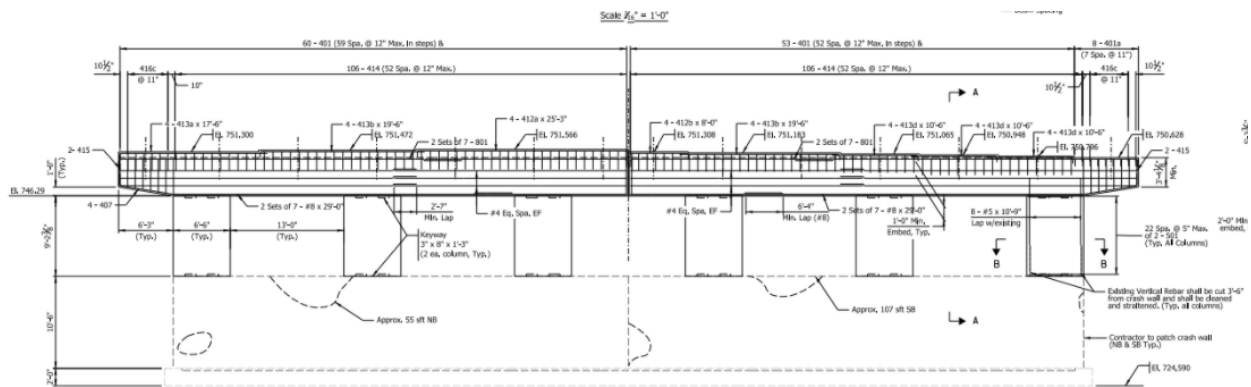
Transverse Elevation of Interior Pier (NBI 42020) (2016)
